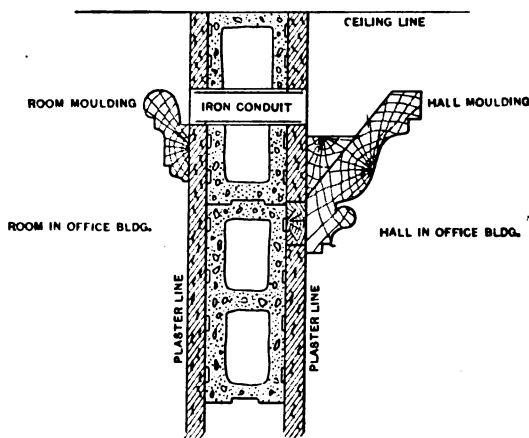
CROSS SECTION OF PARTITION SHOWING HALL MOLDING, ROOM MOLDING AND PARTITION CONDUIT.
